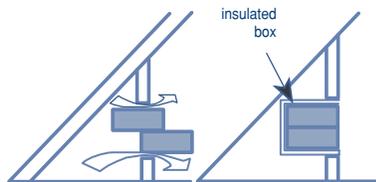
Enclosed storage drawers in the attic should be sealed to prevent air leaks.
